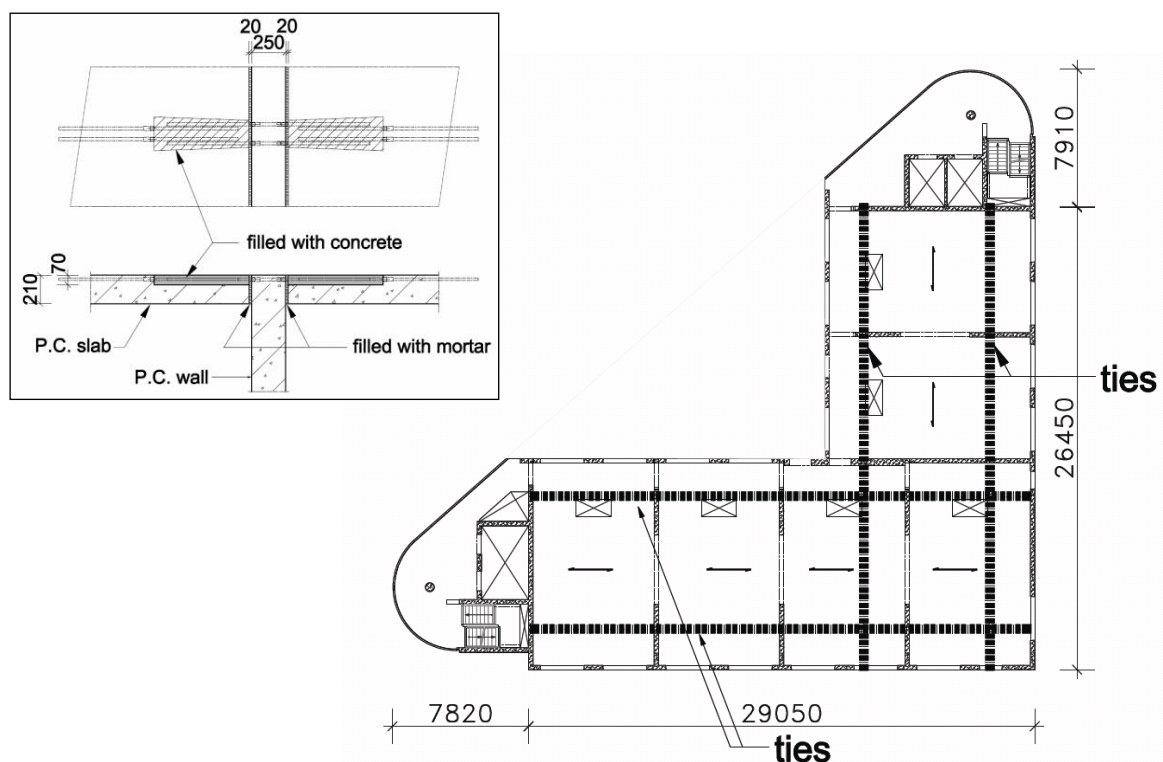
Tension ties layout [Corsmitt PowerPoint]
